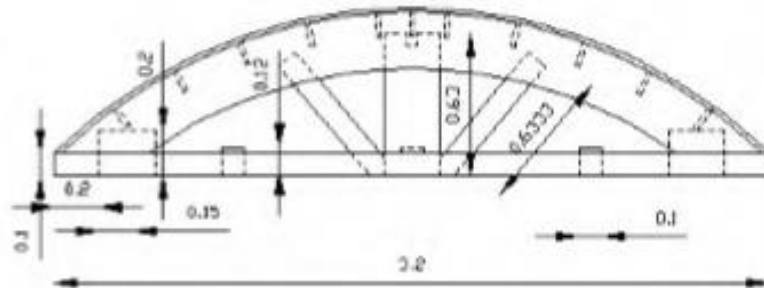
wooden formwork for the ring construction (Serna, J., 2001).
